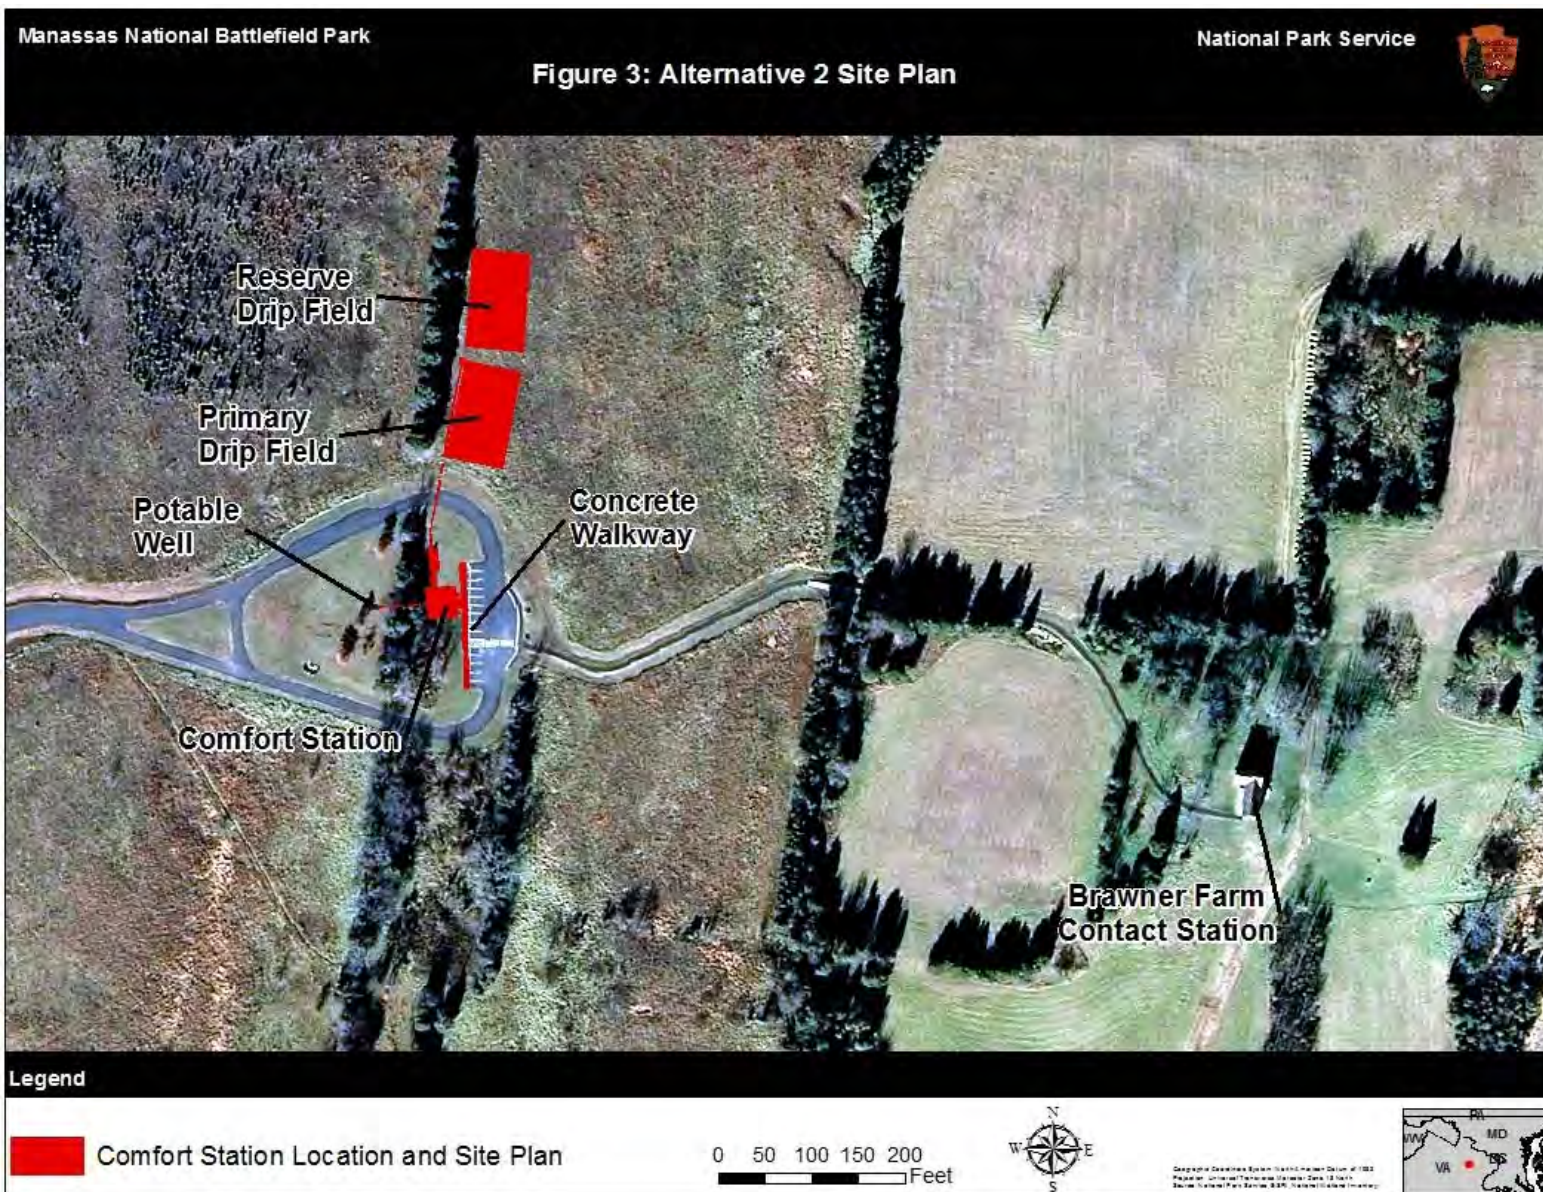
ALTERNATIVE 2 SITE PLAN
